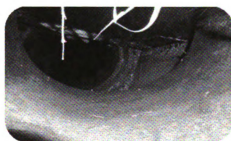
Failure of the Headwall due to Heavy Spalling
